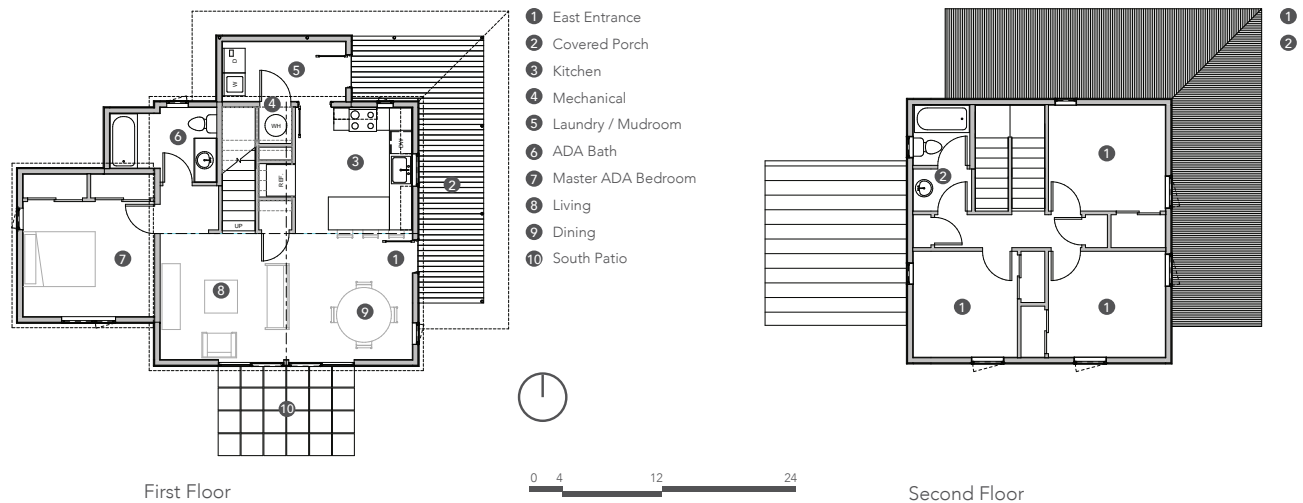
Floor Plan Diagram by Pyatt Studio
